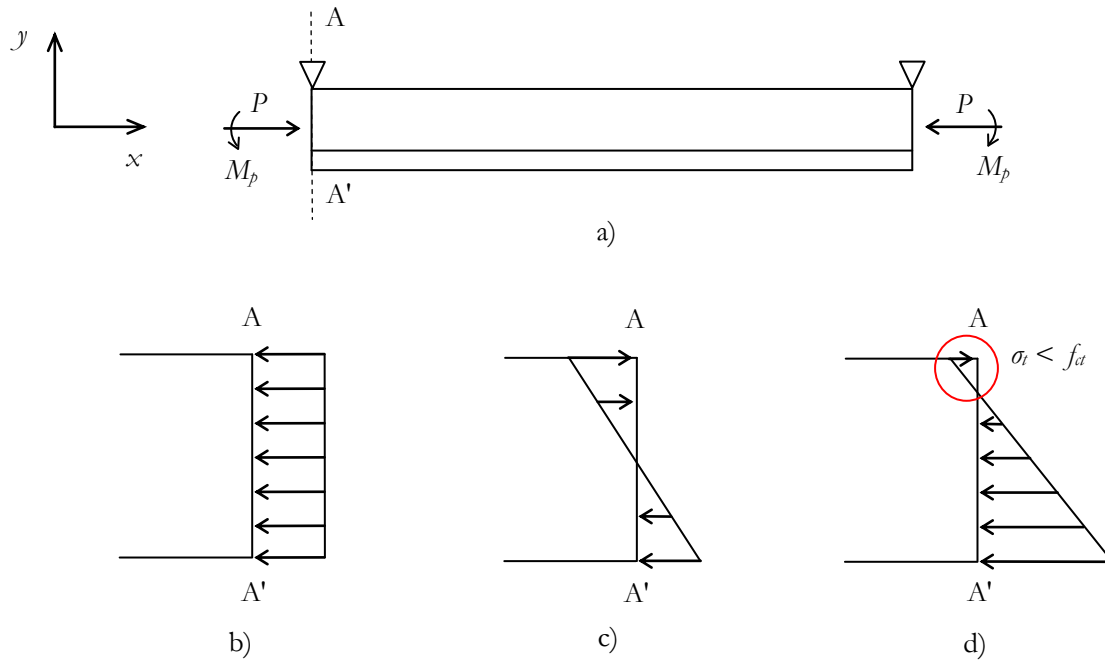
End supported hanging girder a) side view, b) axial force stresses, c) prestressing moment stresses d) final stress state.
